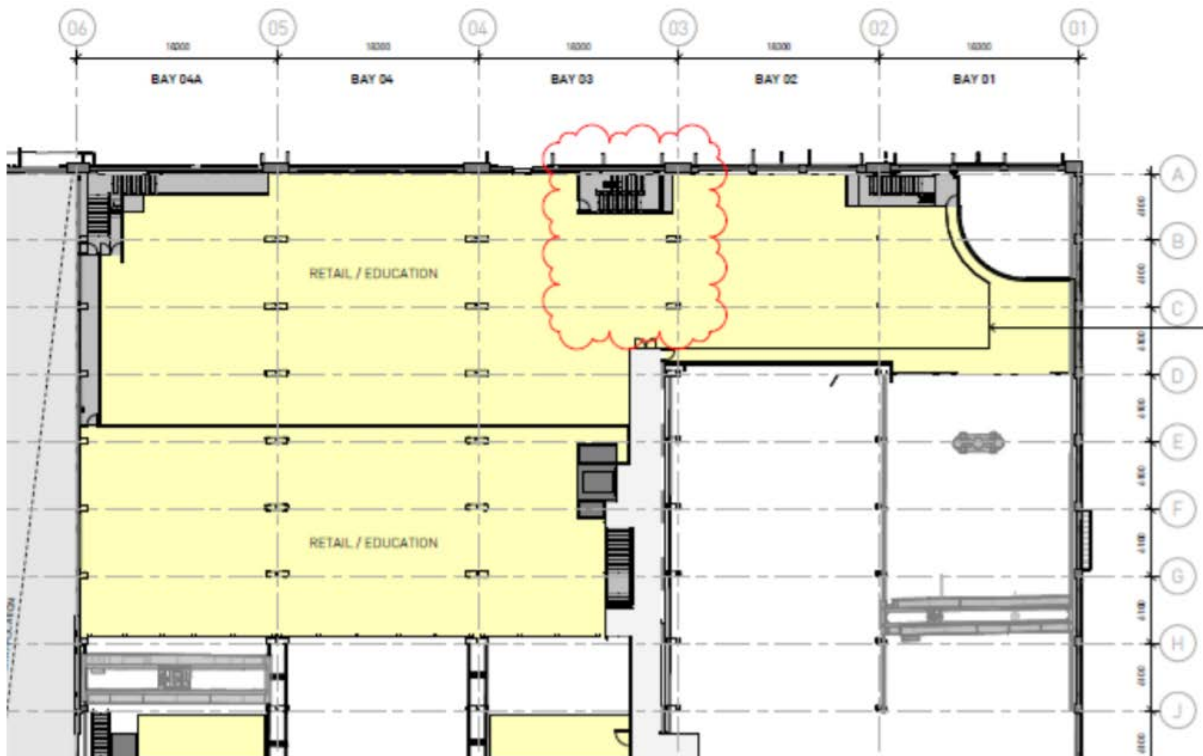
Proposed Modifications Ground Floor Supermarket layout in Bays 3-4a. Modification locations indicated in red. (Source: Sissons 2019)
